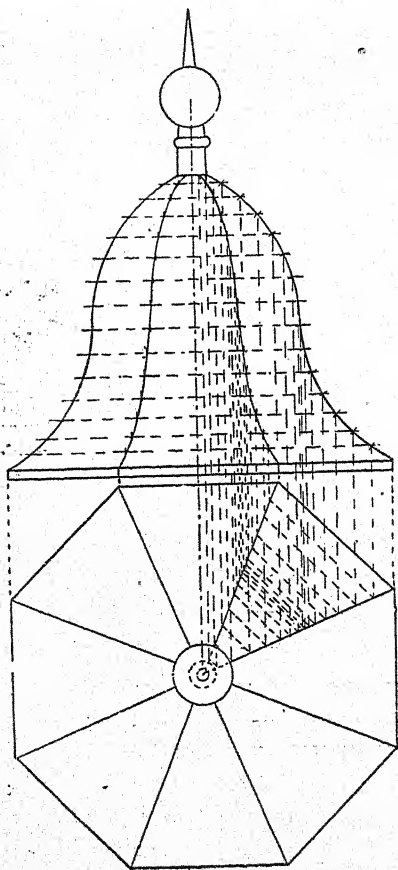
Elevation and Plan of Octagonal Turret Roof.
